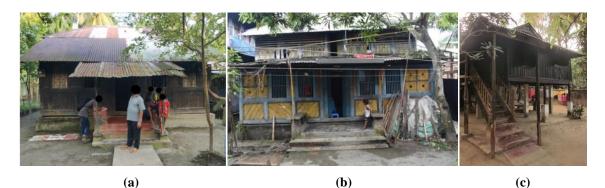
Traditional timber houses of Bangladesh: (a) single-storied, (b) Double-storied and (c) Stilt
